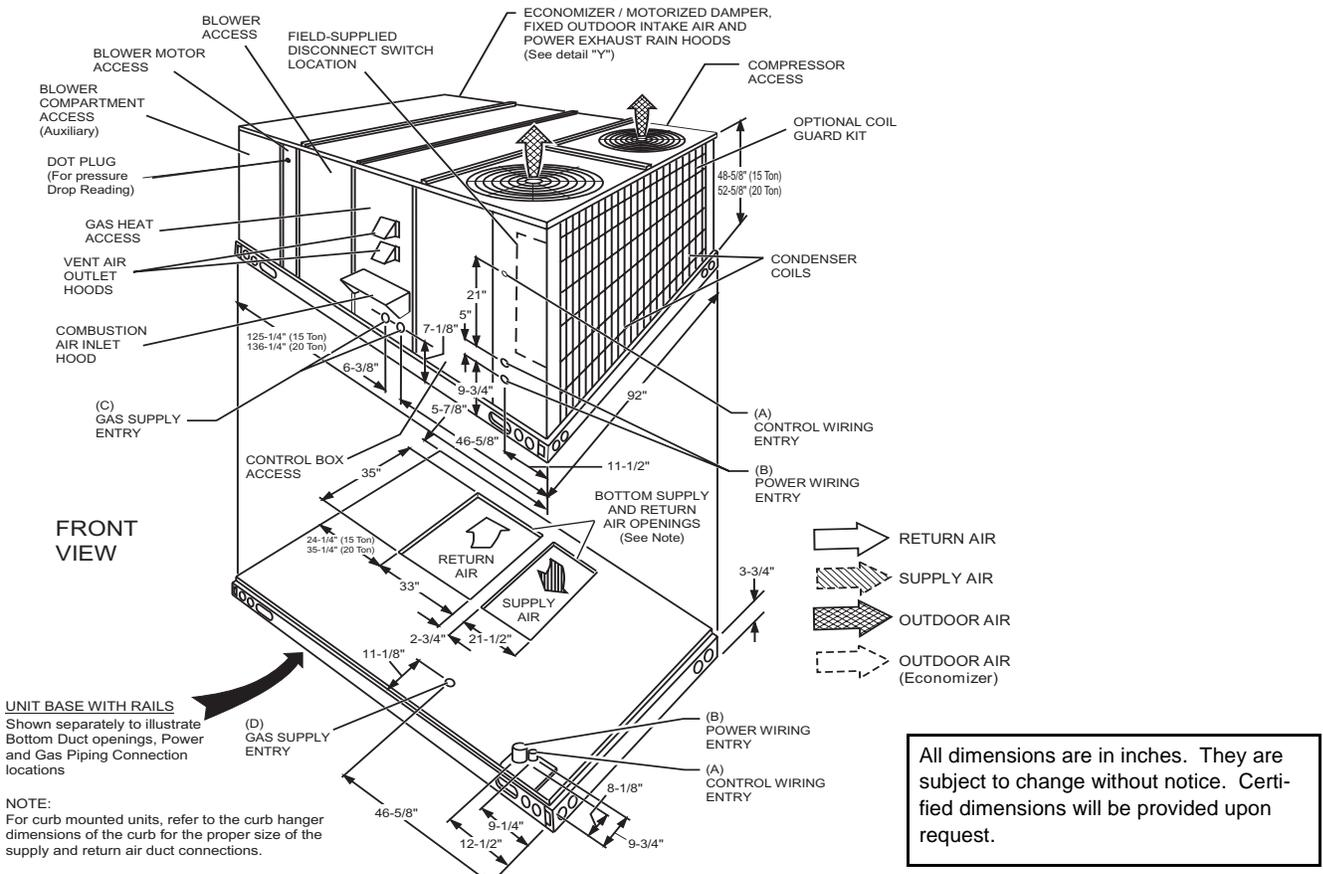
UNIT DIMENSIONS DHG180 & 240 (FRONT VIEW)
